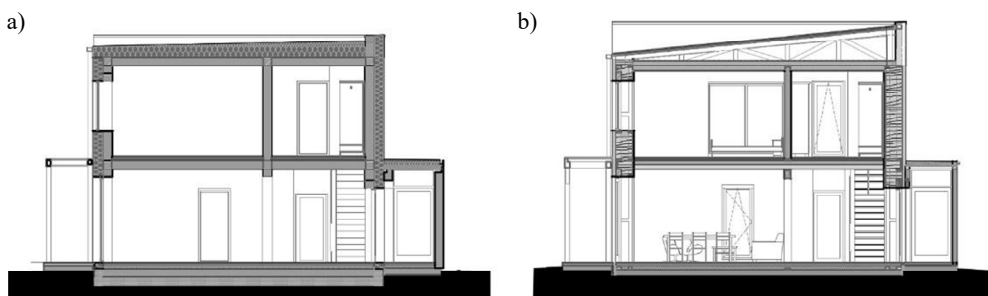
Comparison between the cross sections of a passive building (a) and a straw bale building (b). Source: Own elaboration.
